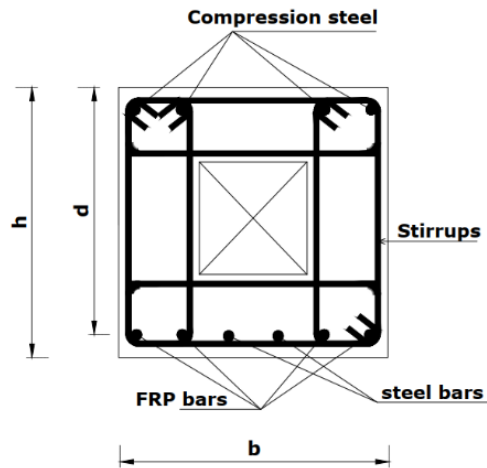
Cross-sectional details of the proposed hybrid-RC box girders.
